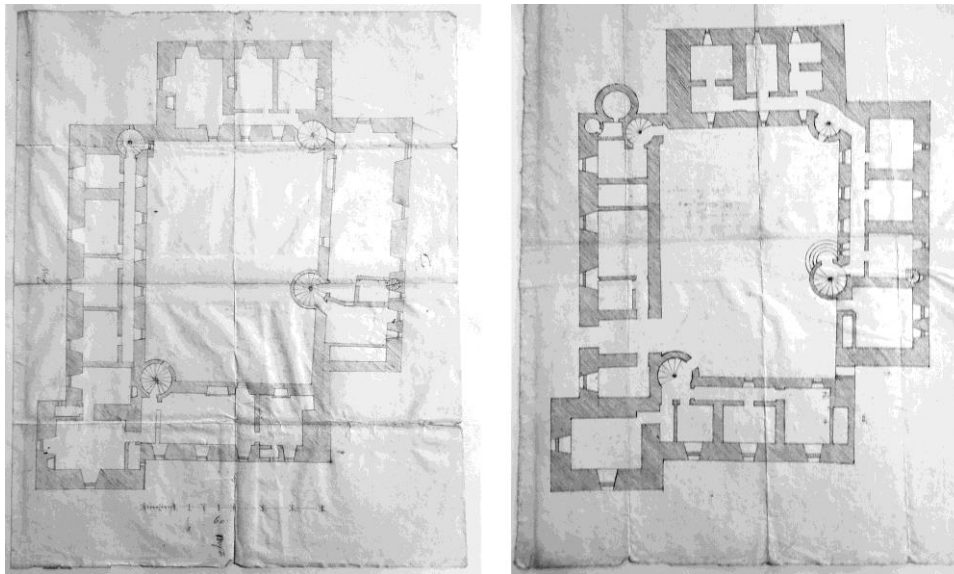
Plans of Drumlanrig Castle '*unreformed*' dated 1608 (left) and 1615 (right). North on the left. (Drumlanrig Castle Archive)
